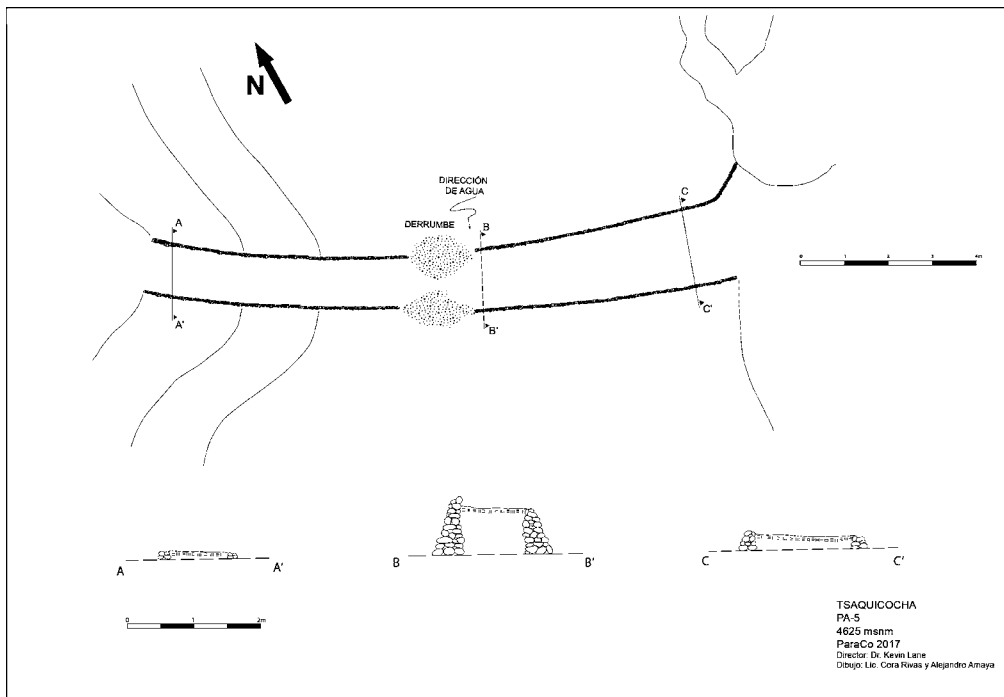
Plan of Pa 5 – Tsaquicocha, Collapampa River.
